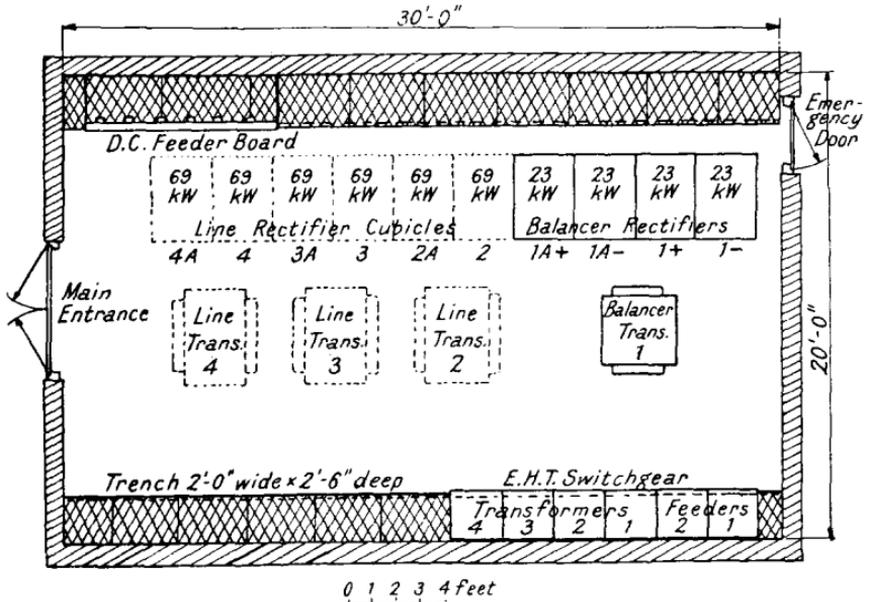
A layout of a glass bulb rectifier sub-station.
